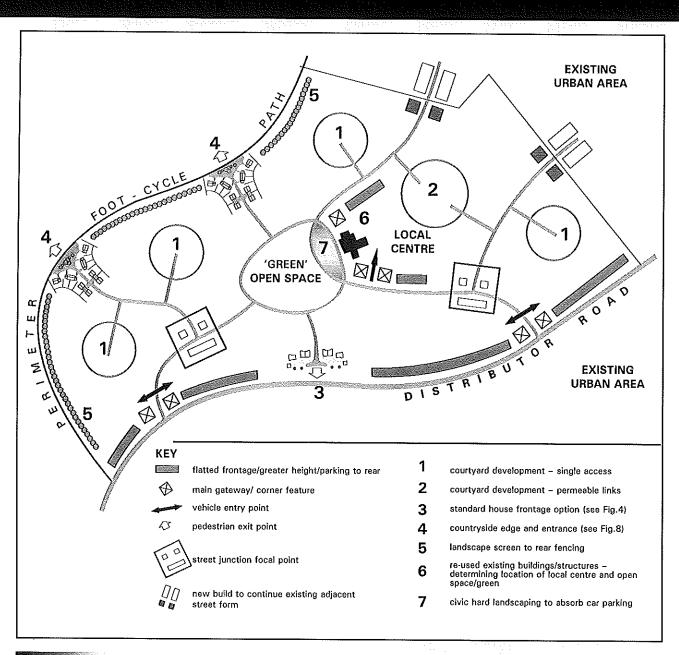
CONTEXT AND PLANNING - TOWN EXTENSION SITE
